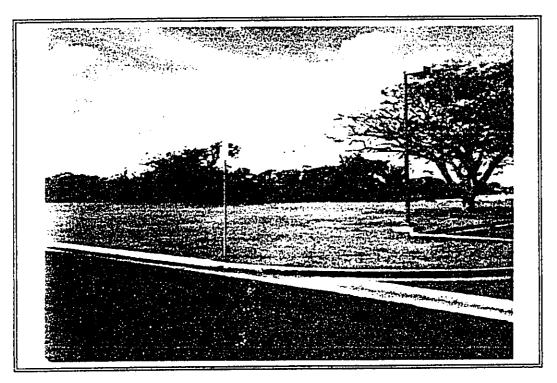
Proposed Pretreatment Facility area looking southwest. SIWWTP parking lot is on the right.
